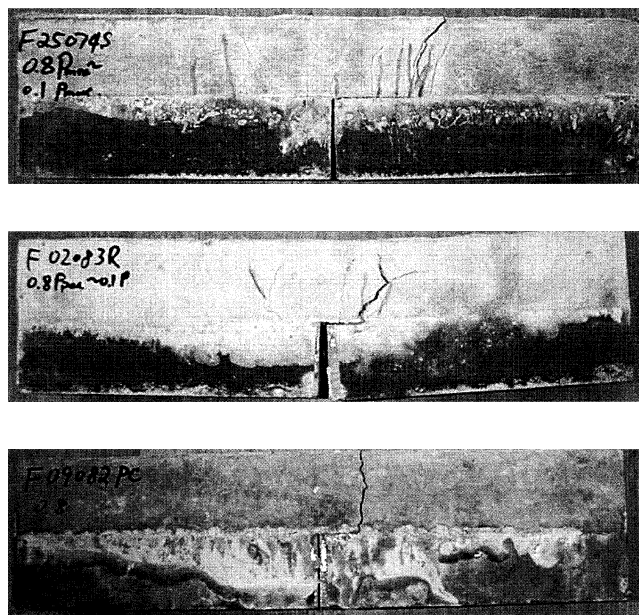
Crack patterns at failure of overlaid beams under fatigue bending load: (a) ECC overlay with smooth casting surface, (b) ECC overlay with rough casting surface and (c) PC overlay with smooth casting surface.
